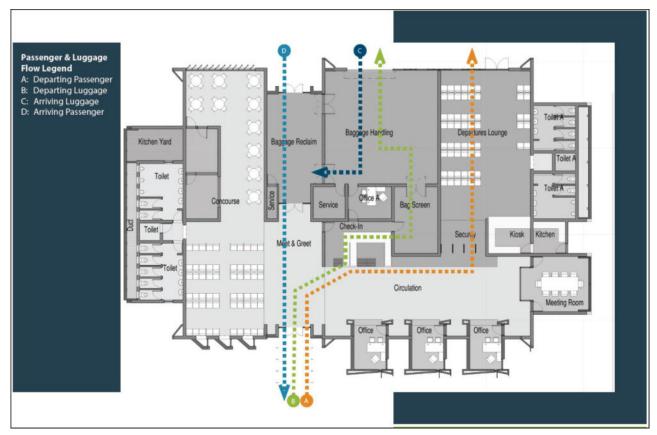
CONCEPTUAL TERMINAL LAYOUT
